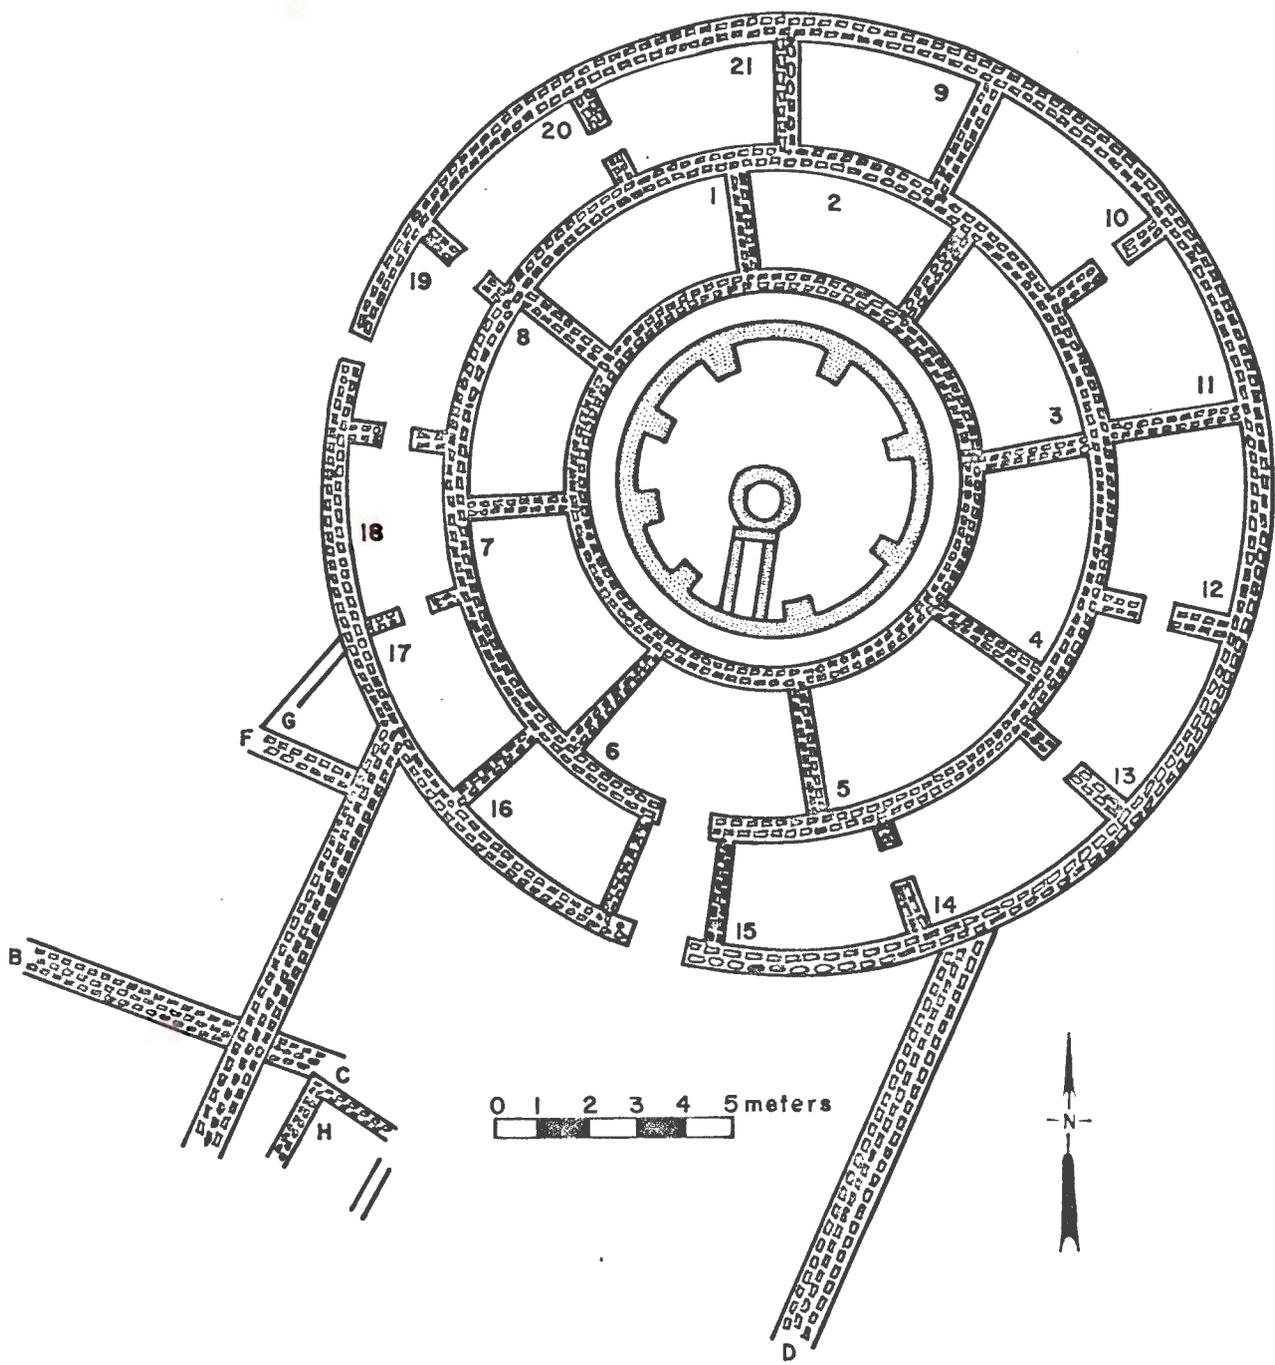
Plan of the tri-wall structure at the Hubbard Site.
